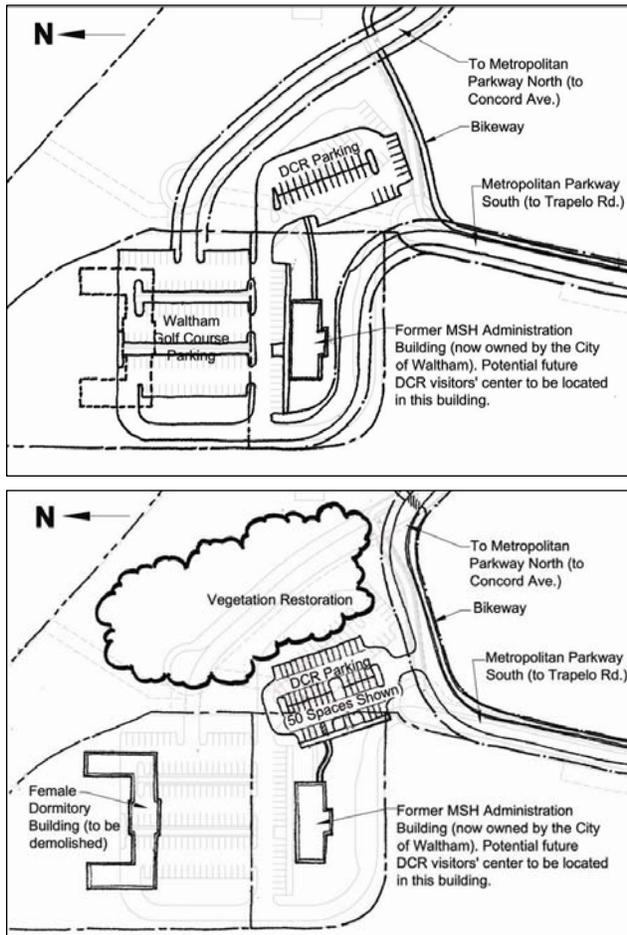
Top – 2004 layout of the DCR and City of Waltham parking areas in relation to the north and south parkway segments (redrawn from Judith Nitsch Engineering, Inc.). Bottom – Conceptual layout for the proposed DCR parking area adjacent to the existing access road constructed by DCAM in 2006 (Pressley Associates).
